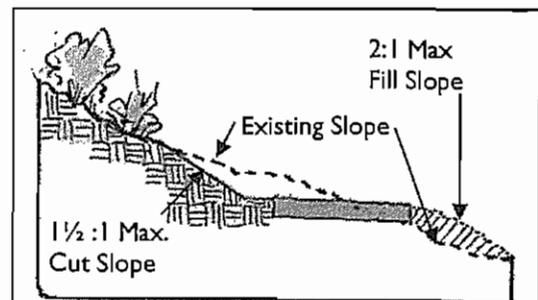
A Full Bench Trail, placed on cut portion of the slope only, provides a more stable base than a trail placed on fill material.
